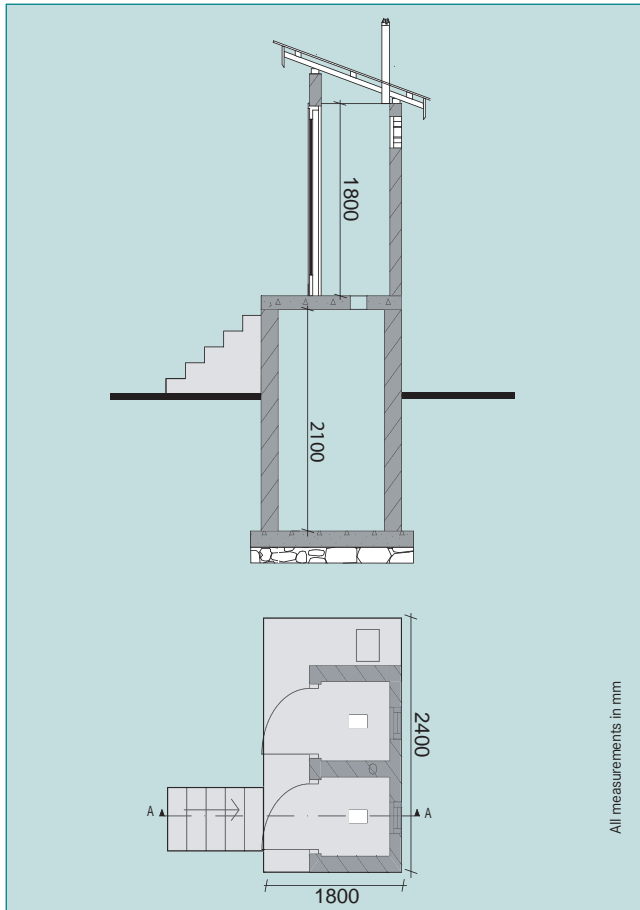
Section and floor plan of raised U-ACT VIP latrine
